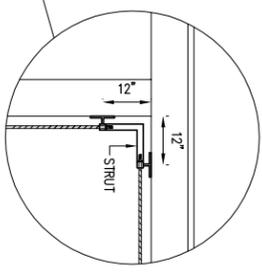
' INSIDE OBTUSE ASSEMBLY
